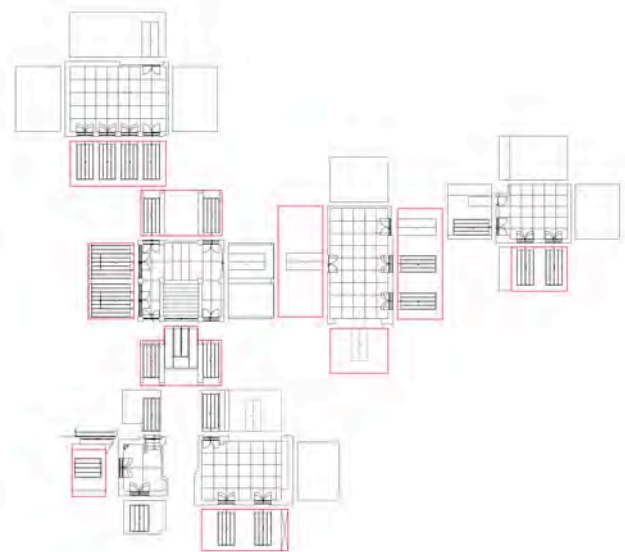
Plan of the main floor in Stonborough Villa. The walls highlighted in red are symmetrical. The Hall is where the focus of the main floor is centered; it is also not possible to reach any room without going through the Hall.
